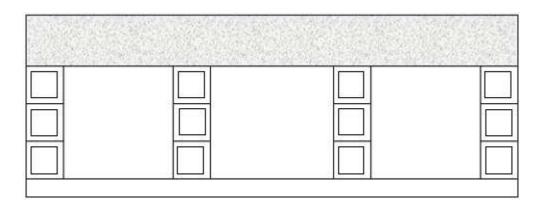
Bridge Deck Produced Using FRP and Concrete
